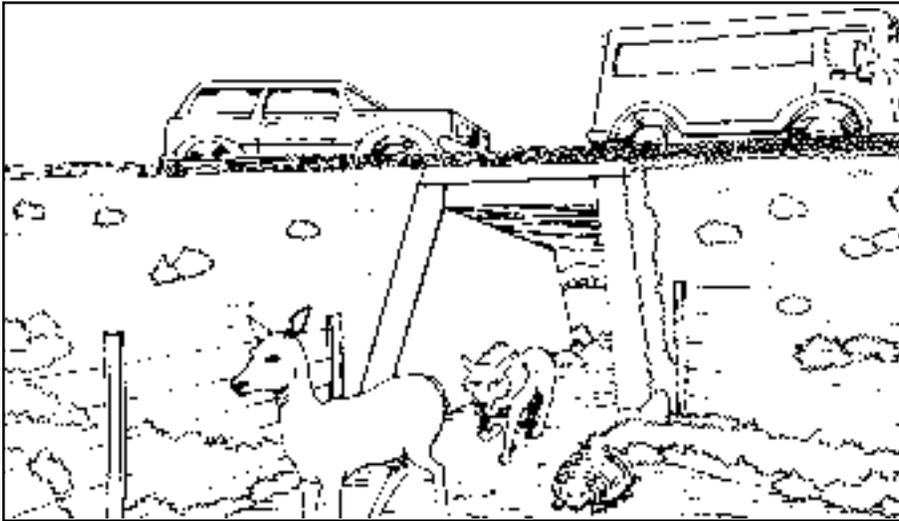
Example of an animal underpass used in road construction to minimize the impact of roads on wildlife migration. Underpasses allow for safe animal crossings and minimize road kill.
